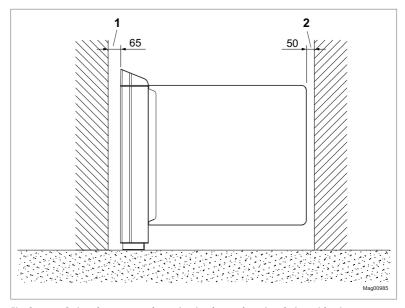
mSwing clearances to be maintained, seen here is mSwing with wing
